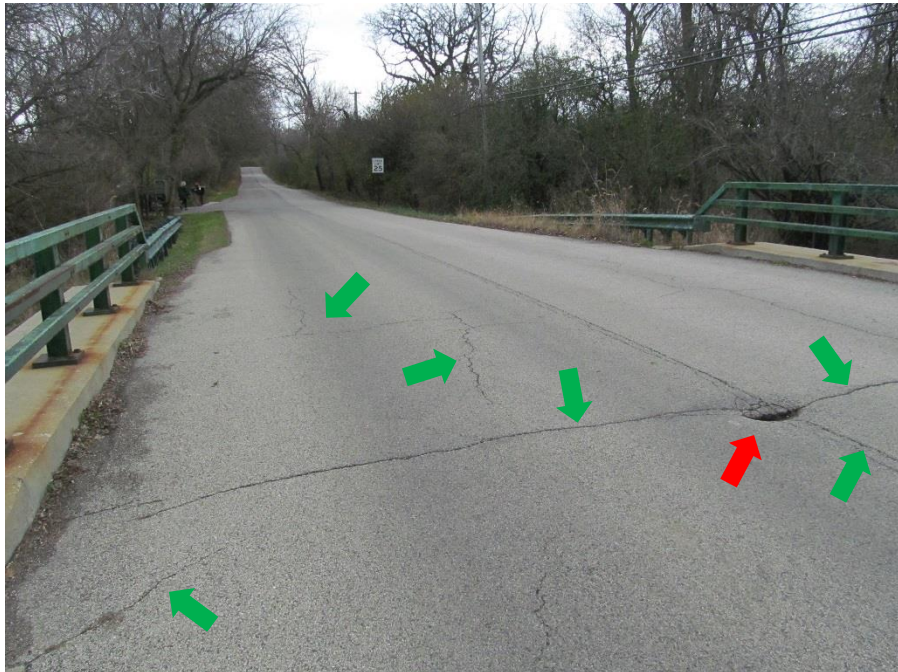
Overall view of the asphalt roadway (facing southeast) showing a depressed area of asphalt pavement (red arrow) and the surrounding cracking (green arrows).
